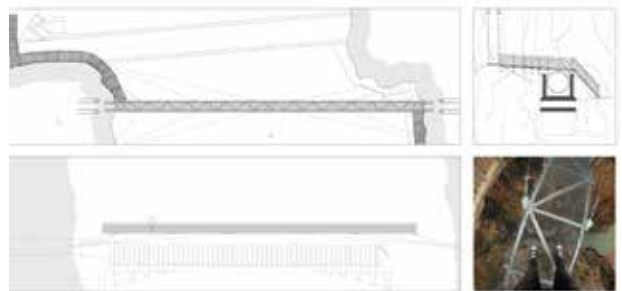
New bridge next to aqueduct bridge: floor plan, elevation, section and image of the footbridge. Source: Machuca Santa-Cruz, Luis (2016). "Recuperación del Caminito del Rey".
